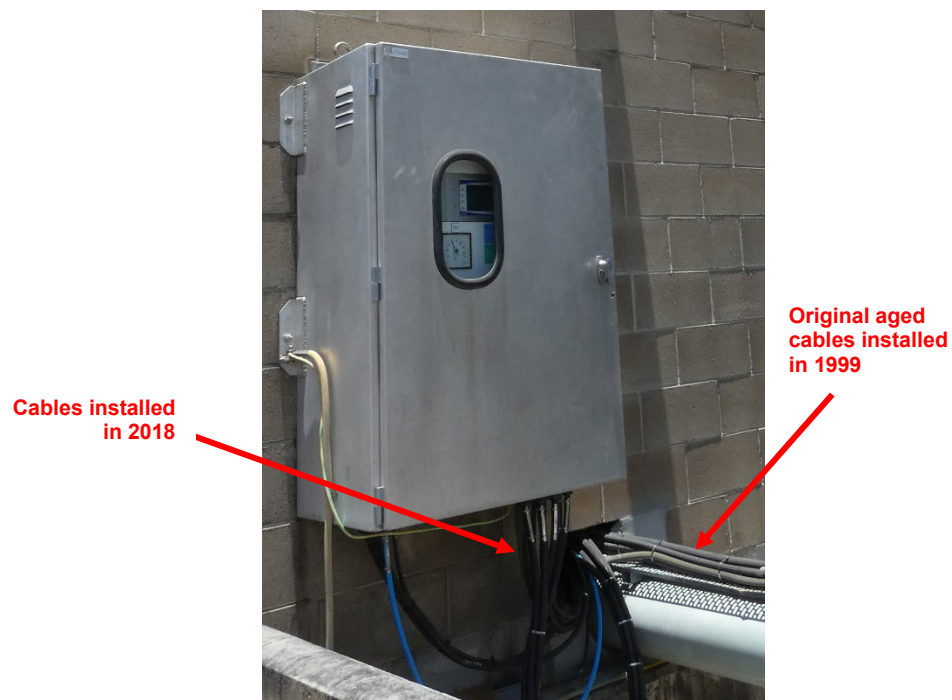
The old and new black PVC/PVC external multicore cabling. Note the aged original cables.
